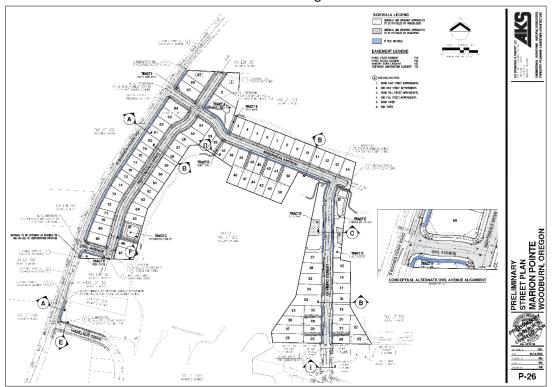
Site Plan Sheet P-26 Sidewalks (blue: min 8 ft wide); see Attachment 103 for full size
